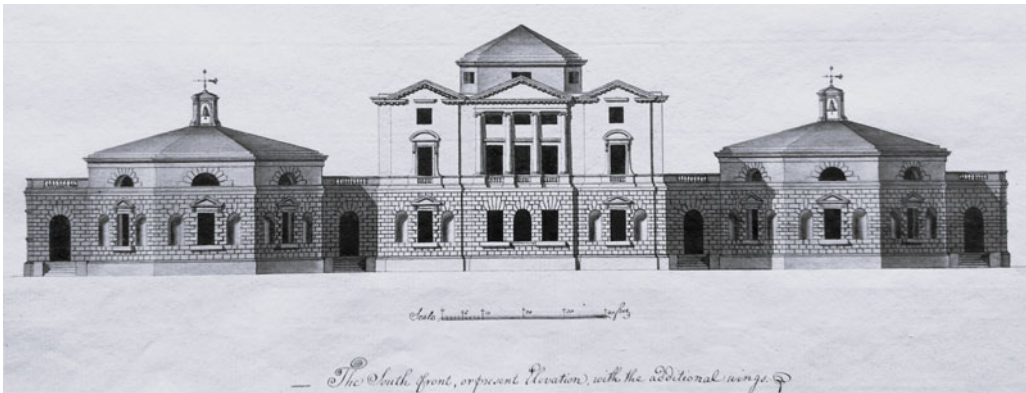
John Carter, south elevation of Bywell Hall. Paine's house in centre, pavilions by Carter.
